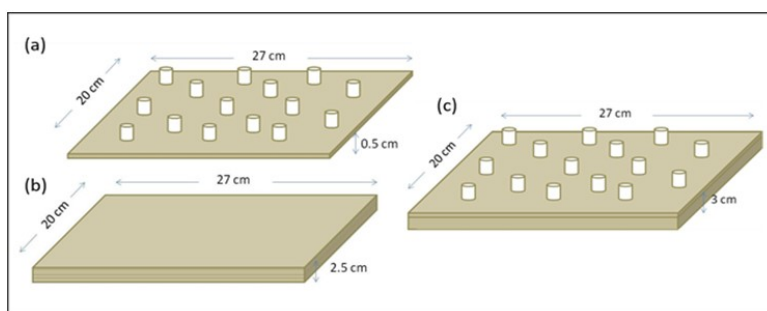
(a) Upper layer with deposition of caps; (b) lower base; (c) design of the prototype of the insulating panel for underfloor heating
